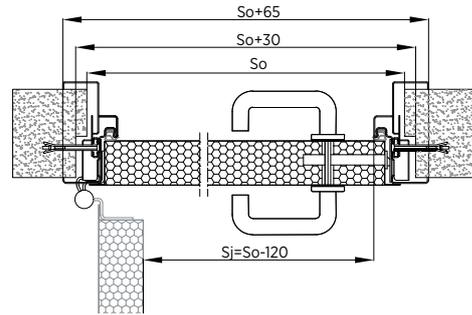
Installation of the single-leaf door to a masonry wall - wrap-around frame with a thermal break - horizontal cross-section
